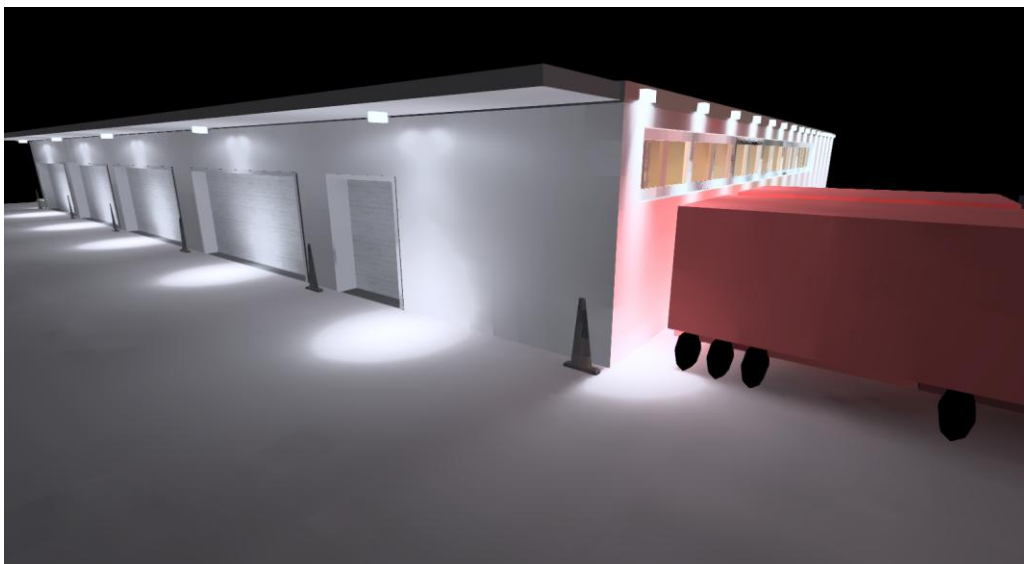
DIALux 3D Lighting Layout – Outdoor Area
